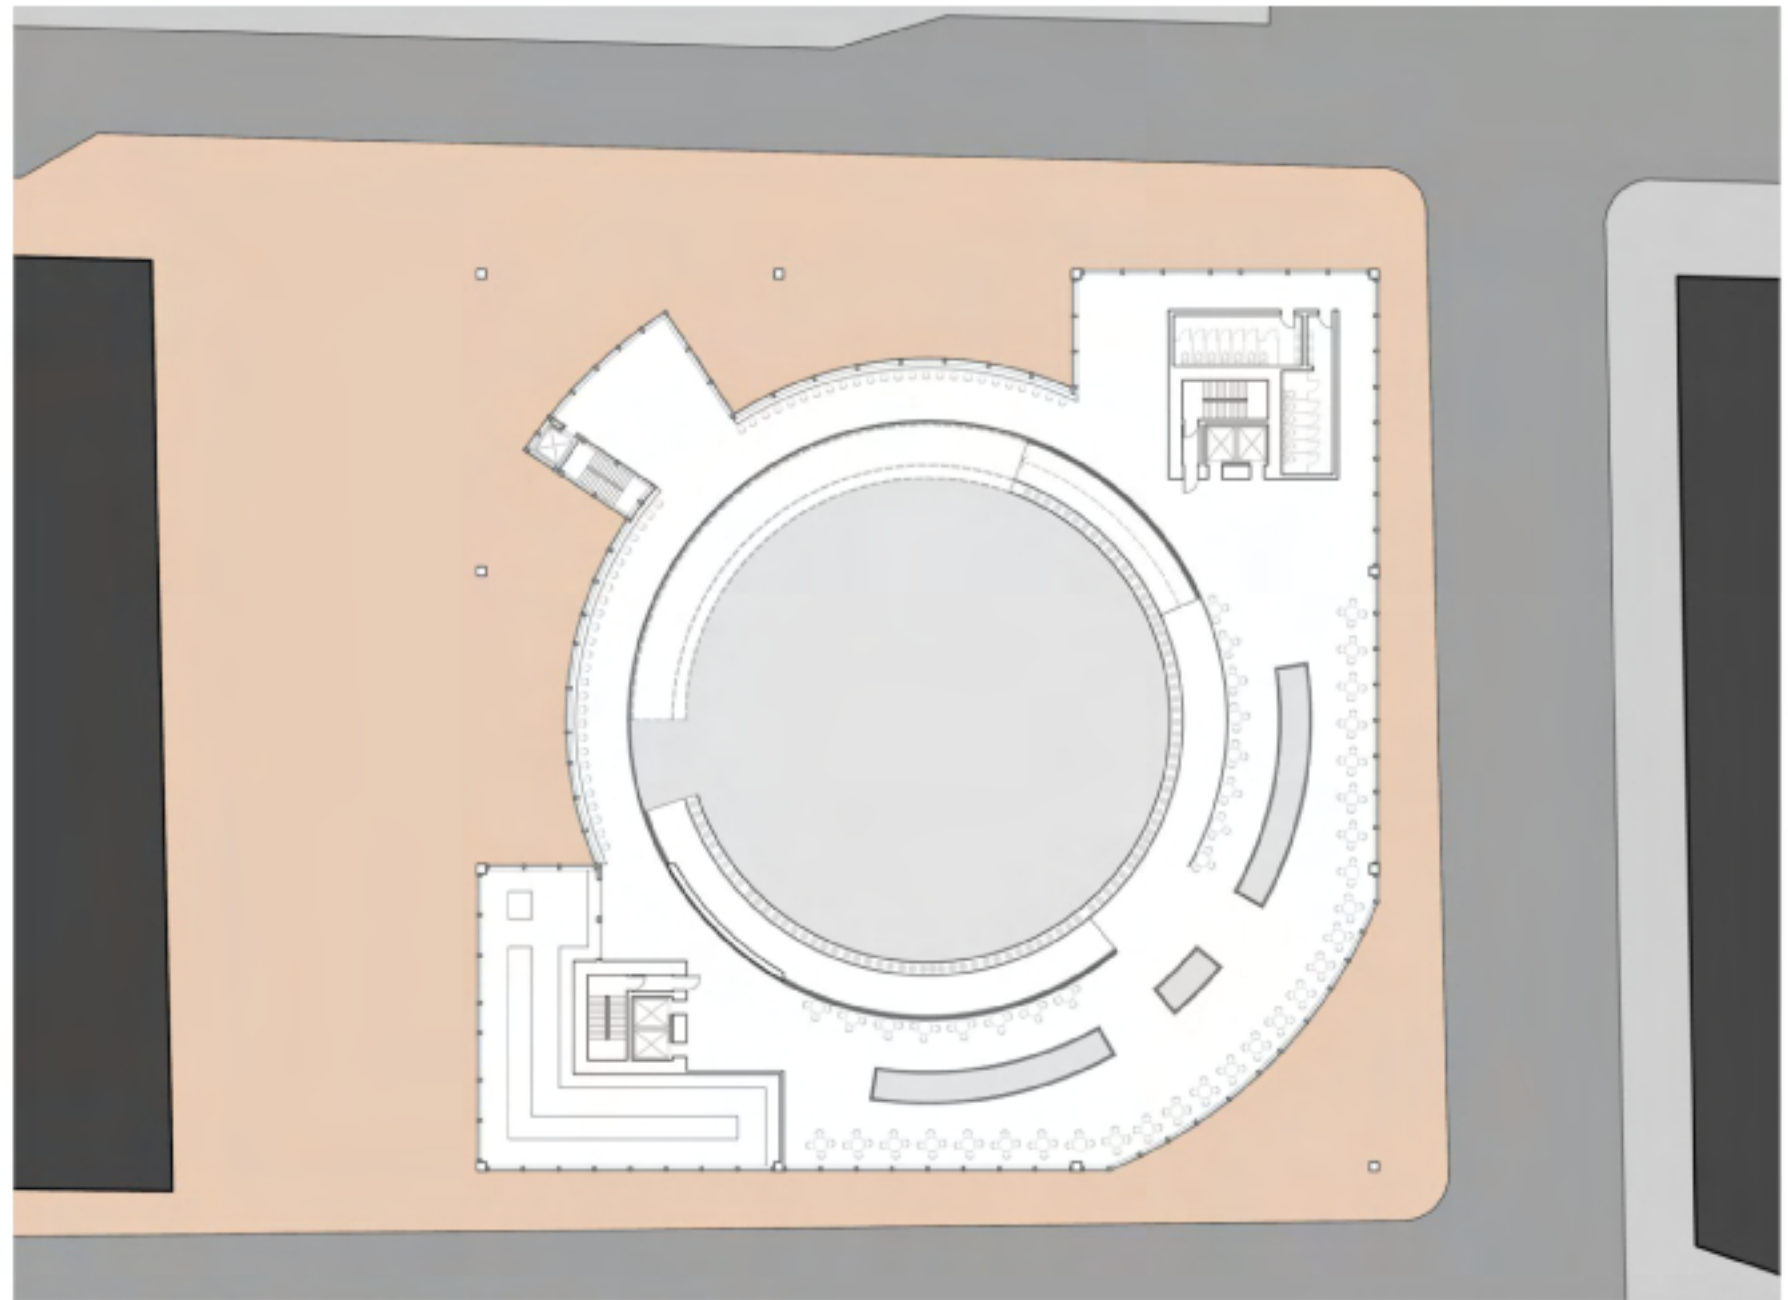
Second Floor Plan [Created using AutoCAD and Photoshop]
